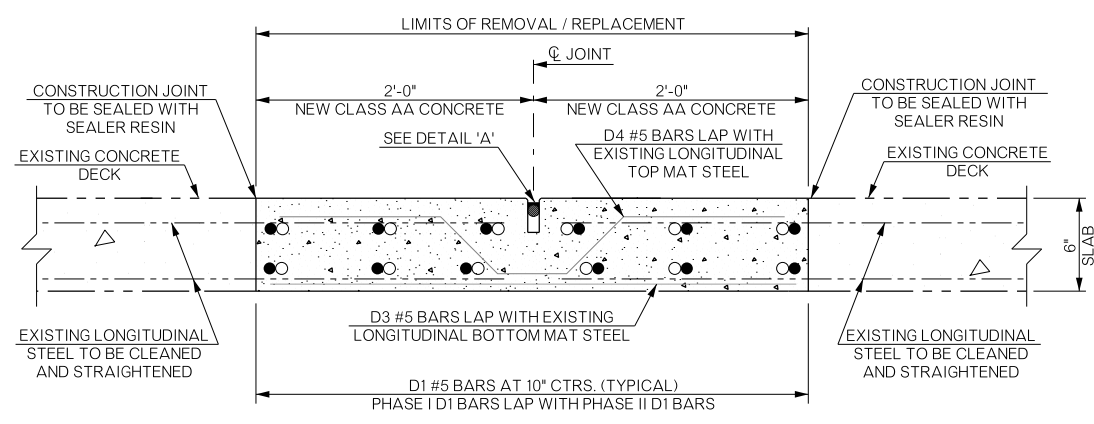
DETAIL OF DECK REMOVAL AT CONSTRUCTION JOINT
